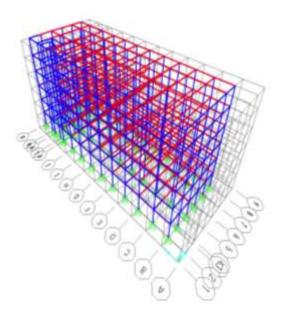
shows the 3D view of the G+5, commercial building with a storey height of 3m. the total height of the building is 18m, situated in Yadagiri, Karnataka, India.
